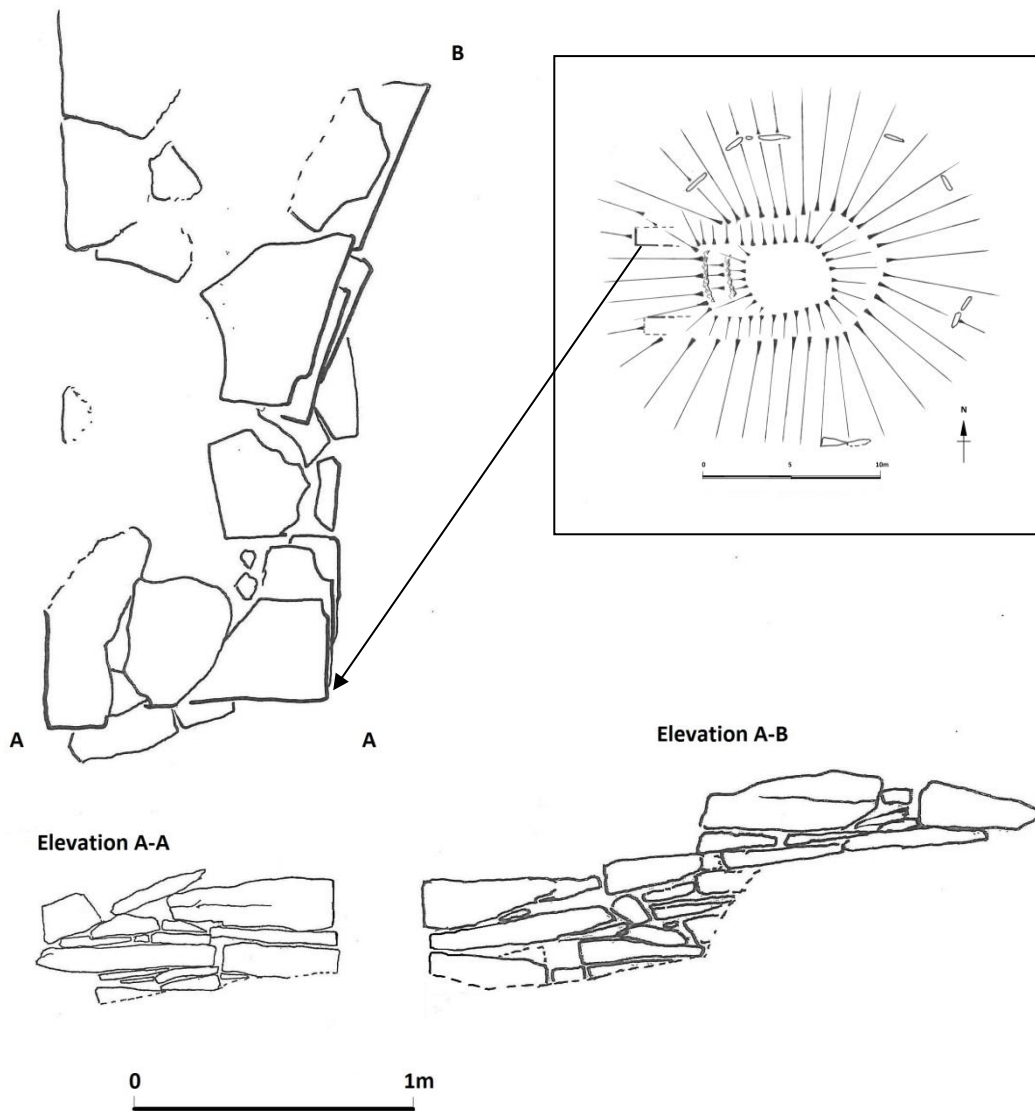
Detail of remaining elevations of northern wall of Limekiln (West facing (A-A) and south facing (A-B) elevations).
